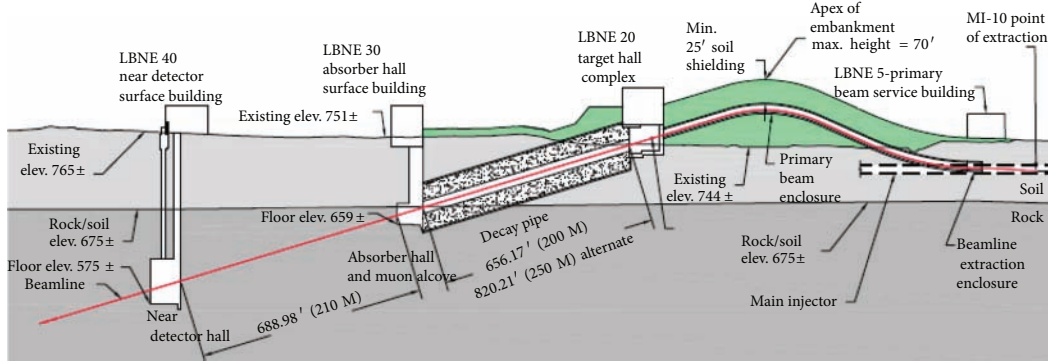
Schematic view of the LBNE beam design located at Fermilab.
